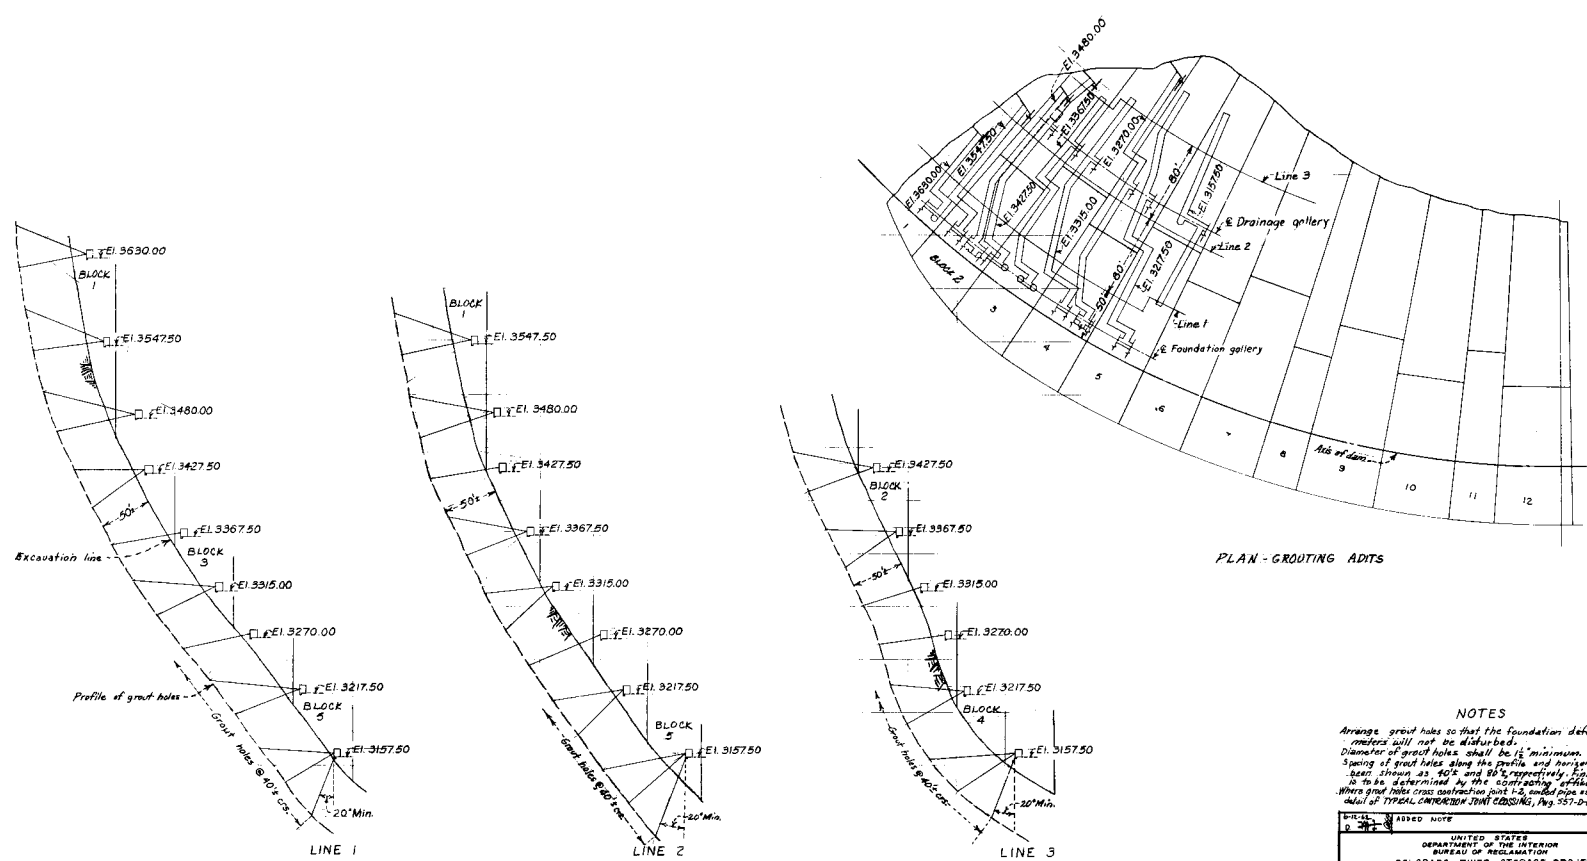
Dam foundation grouting—A-holes, (Sheet 2 of 2.) From drawing No. 557-D-1638.
